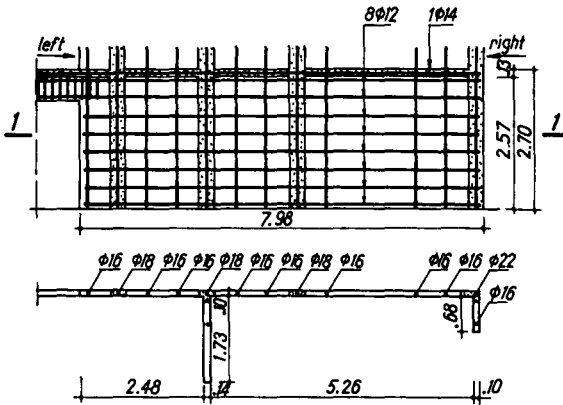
Detail of first storey of shear-wall No. 2 of cross wall DT 1 (see Fig. 7.3a). Only tie and projecting bars are depicted.
